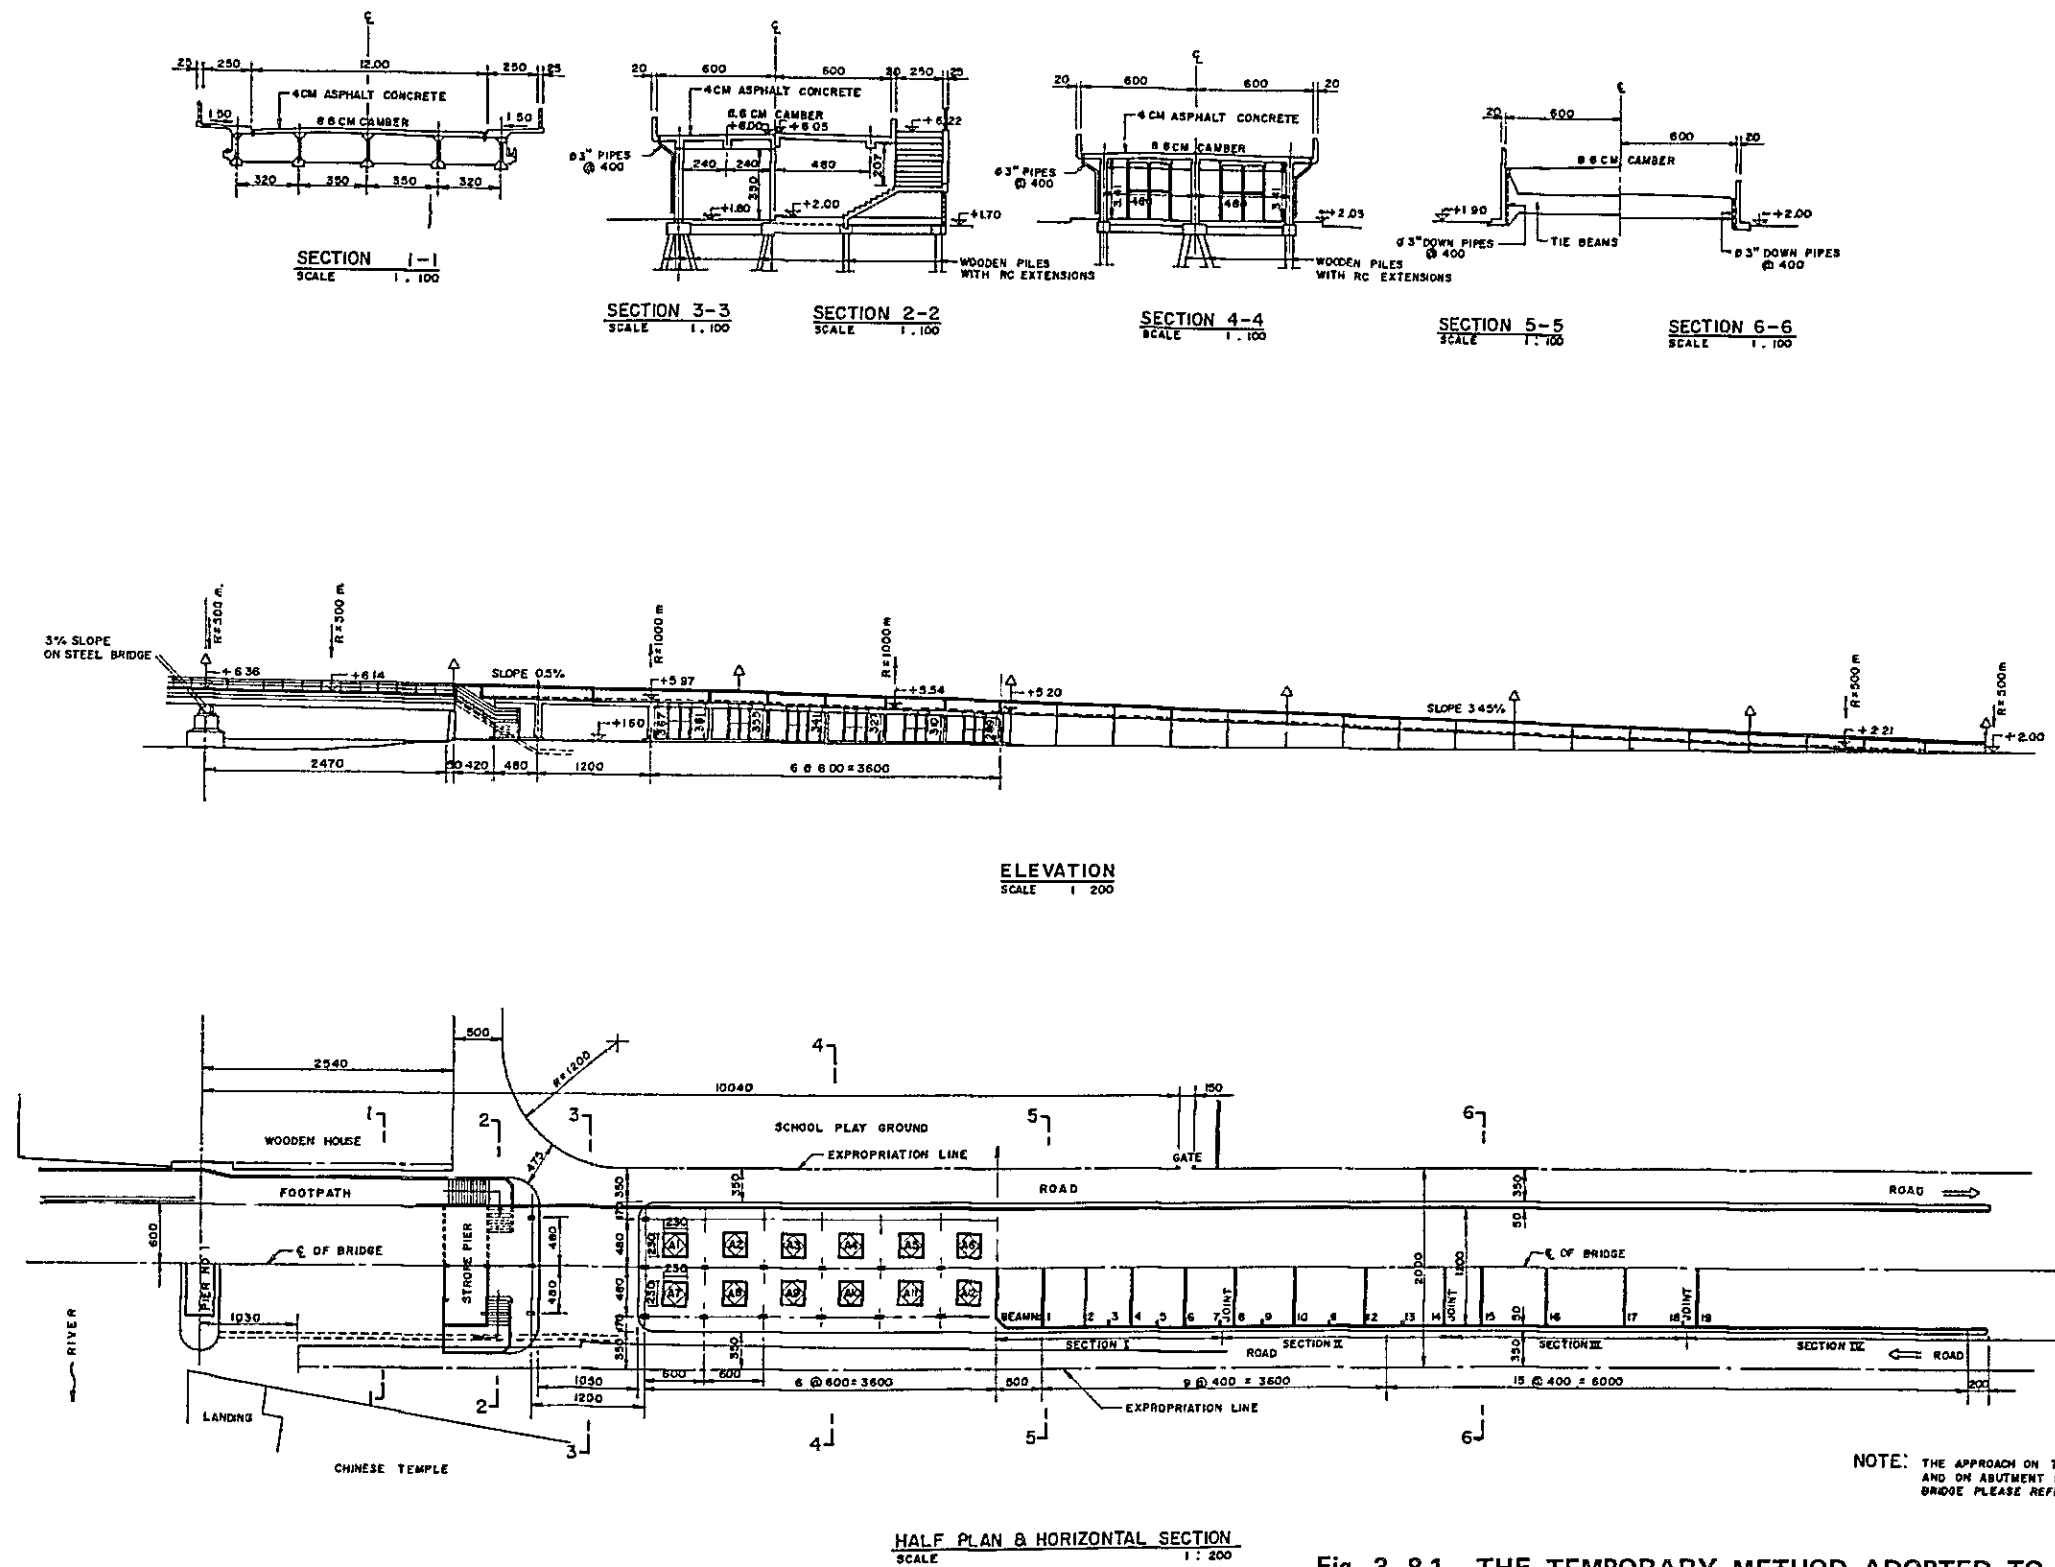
THE TEMPORARY METHOD ADOPTED TO STRENGTHEN THE CONCRETE FLOOR SLAB OF THE APPROACH BRIDGE — KRUNG THON BRIDGE
